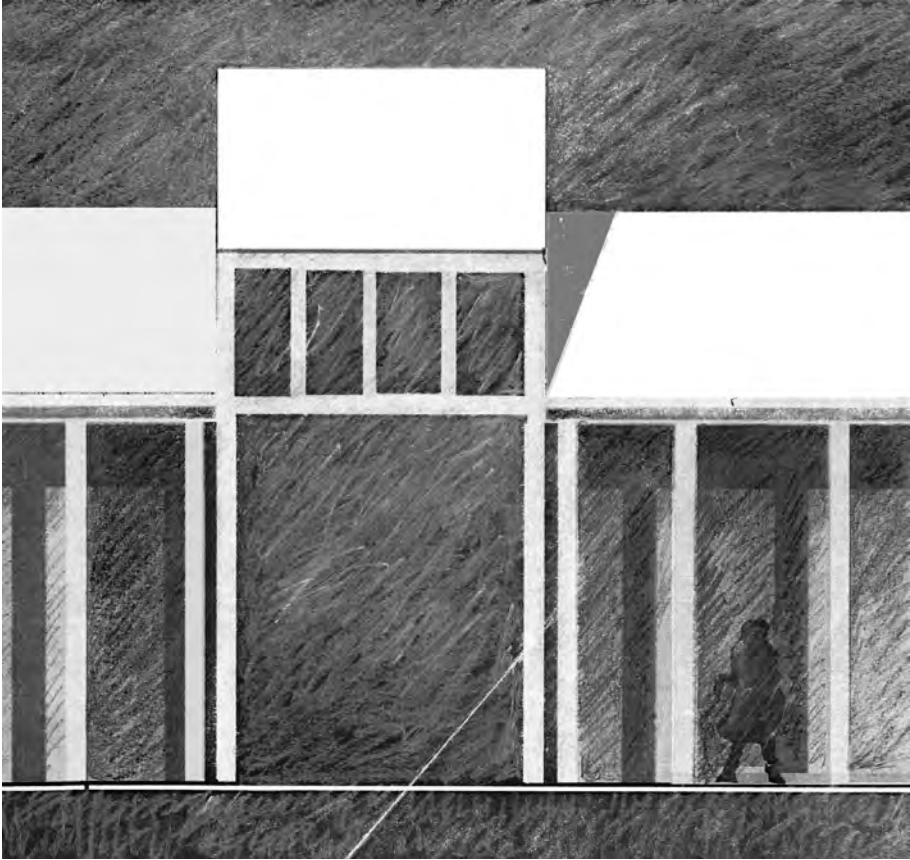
Detail sketch of the new single-storey pavilion under construction.
